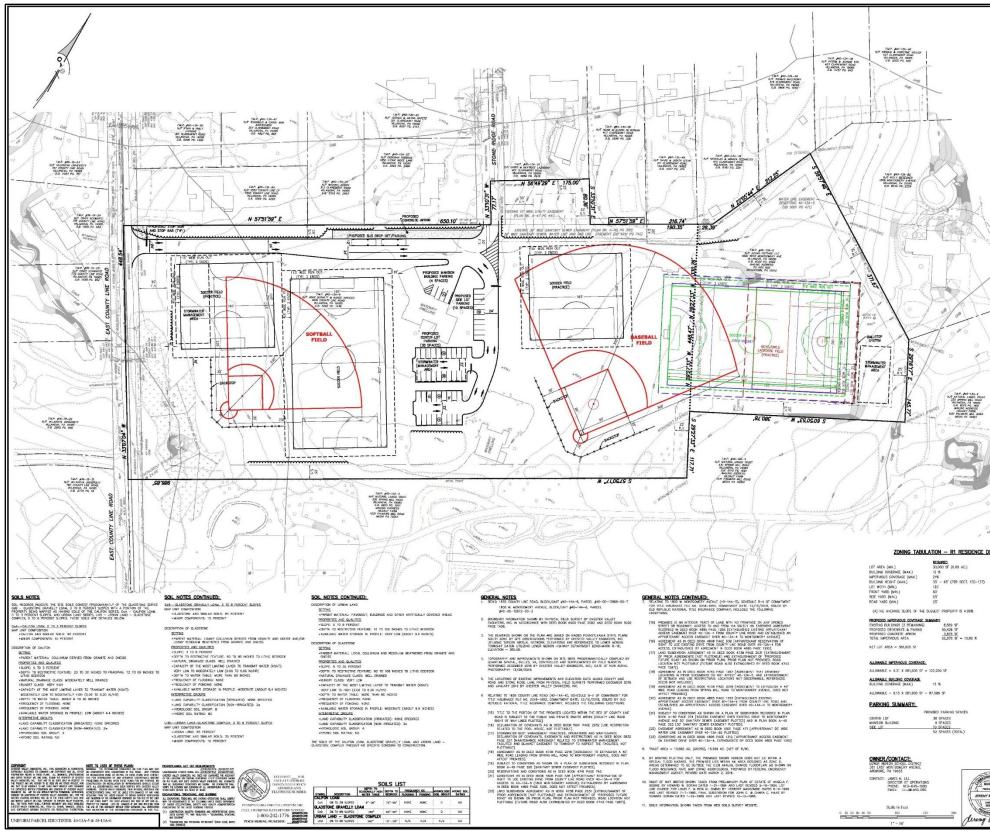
Detail of Tentative Sketch Site Plan, Proposed Field Site, 1835 County Line Road (Chester County Engineers, Plan Dated 4/15/19).
